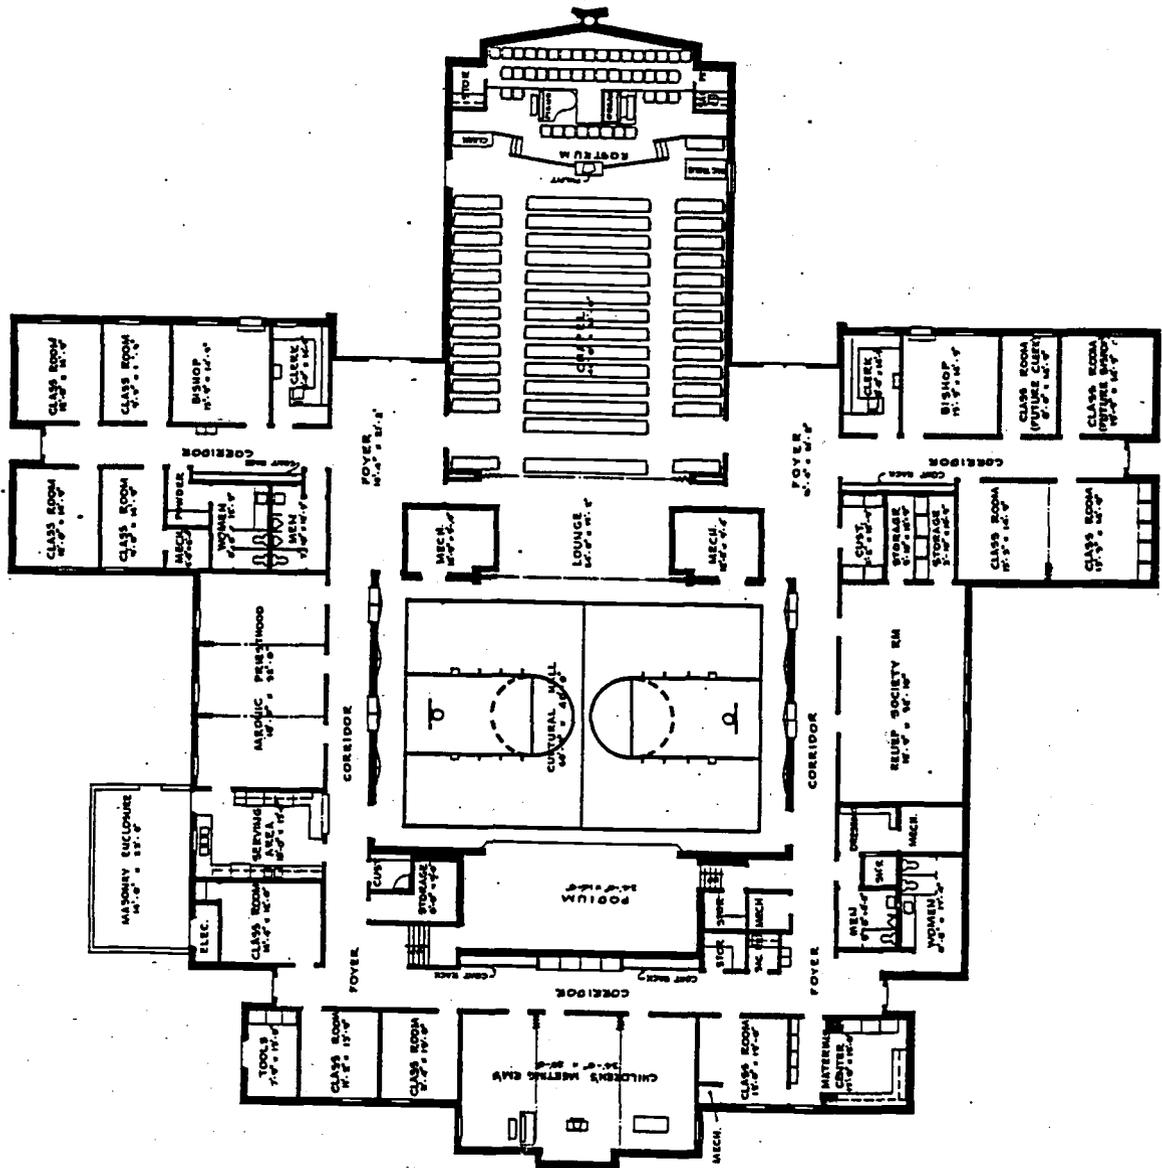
Multiple ward meetinghouse with a T-shaped plan. LDS Church Architectural Services Division.
